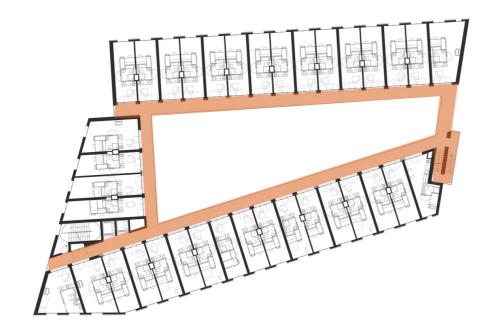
Diagonal Besòs Student Residence Second Floor Plan Source: MDBA Architects
